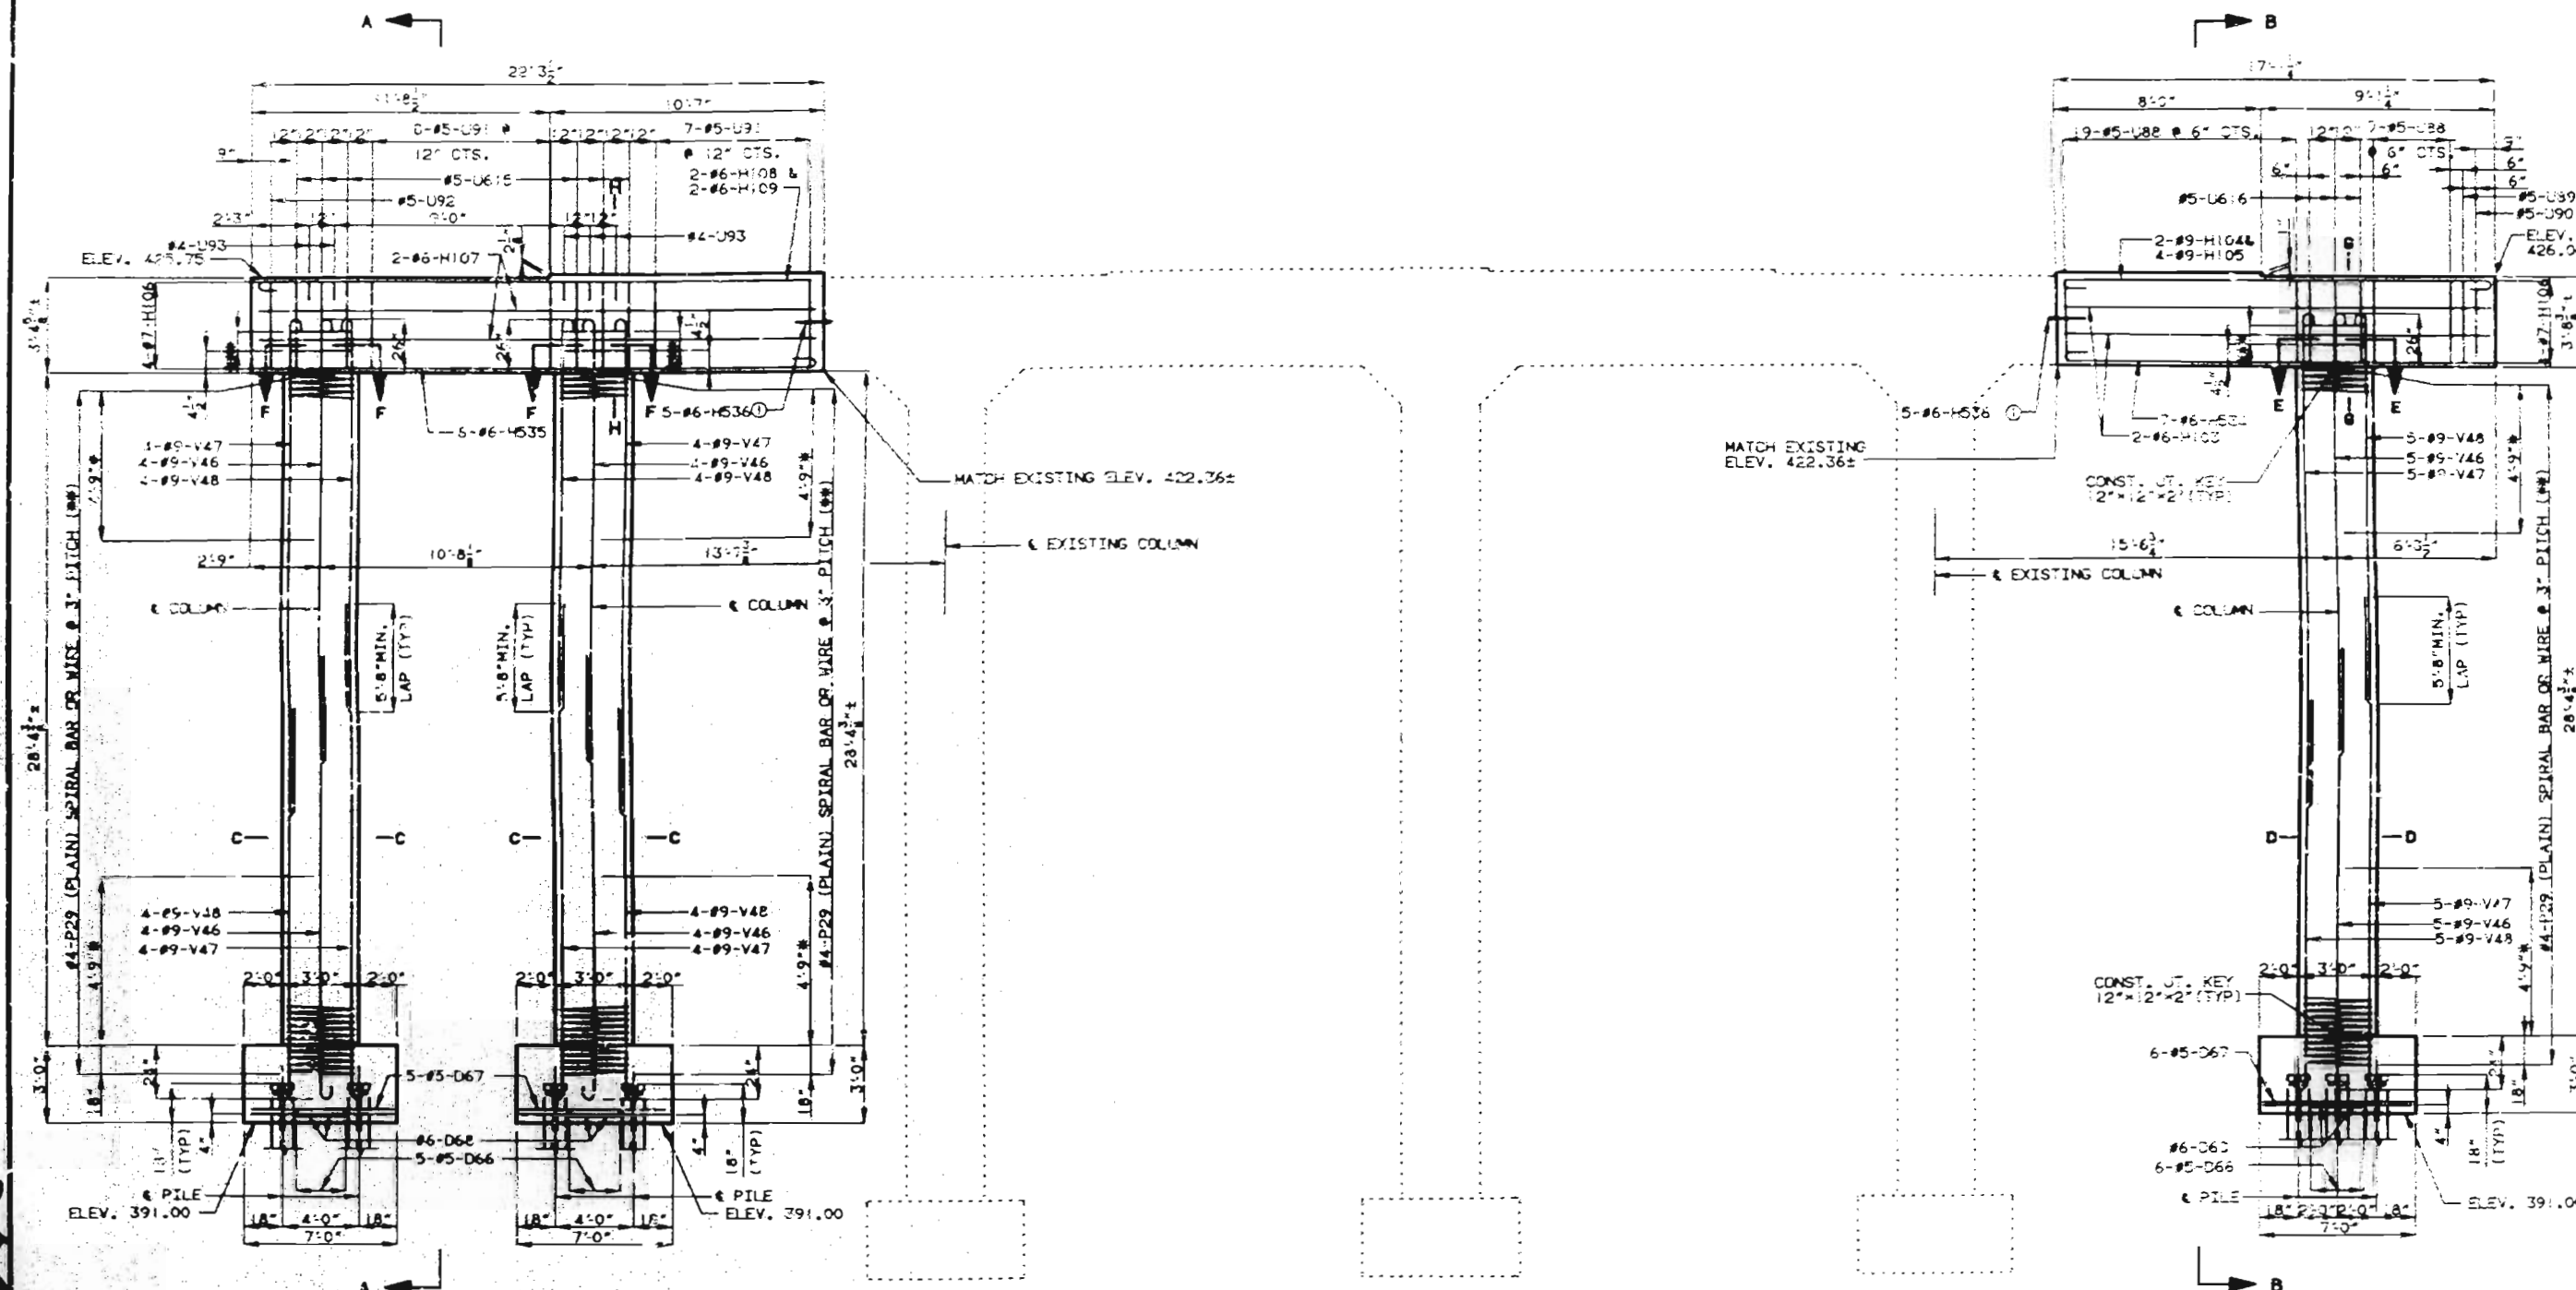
# DETAILS OF INT. BENT NO. 8 (SOUTHBOUND LANE)
